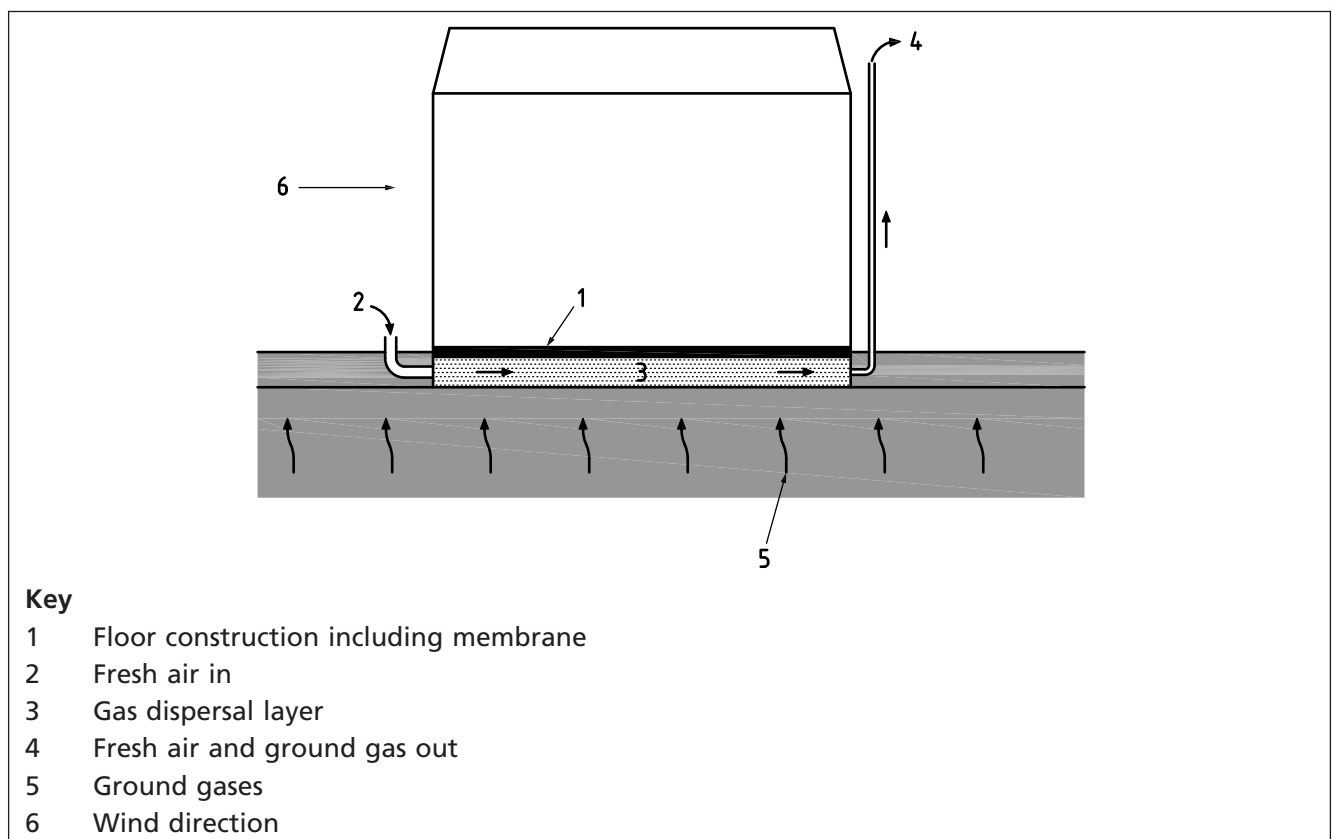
Typical passive ventilation arrangement with floor slab below ground level and high level vents
